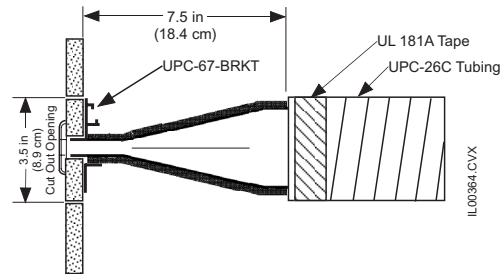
Existing Wall Cut-out Opening, Straight Outlet
